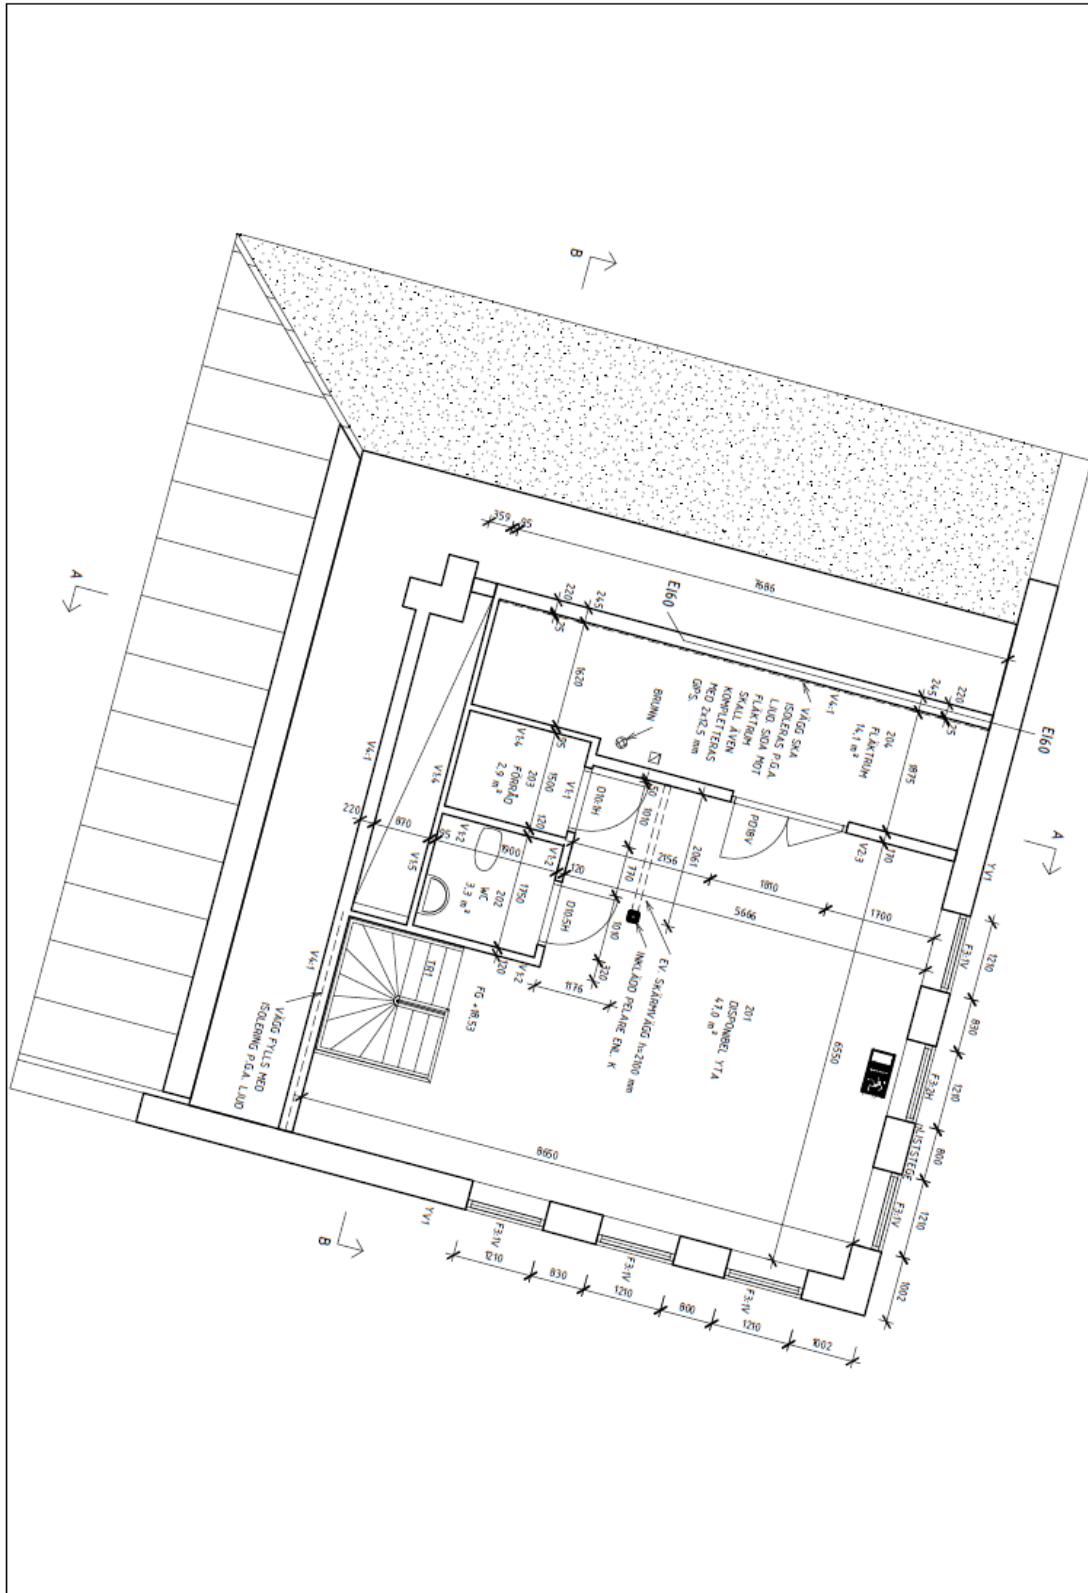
Plan drawing, 2nd floor in Community building (Architect: Håkan Markgren)..
